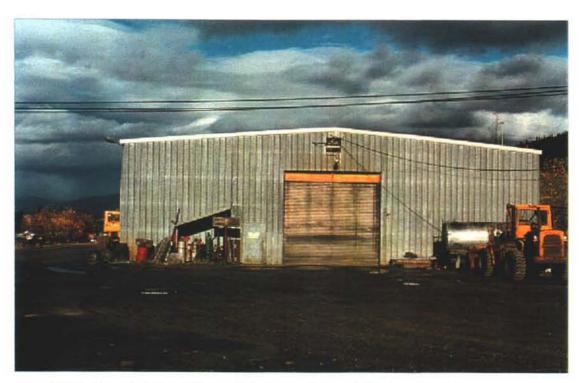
Elsa. Building #9 is the Main Shop. (Azimuth 040°)
